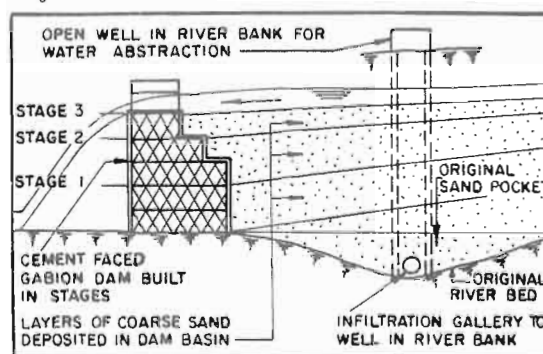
STAGED DEVELOPMENT OF SAND STORAGE DAMS
